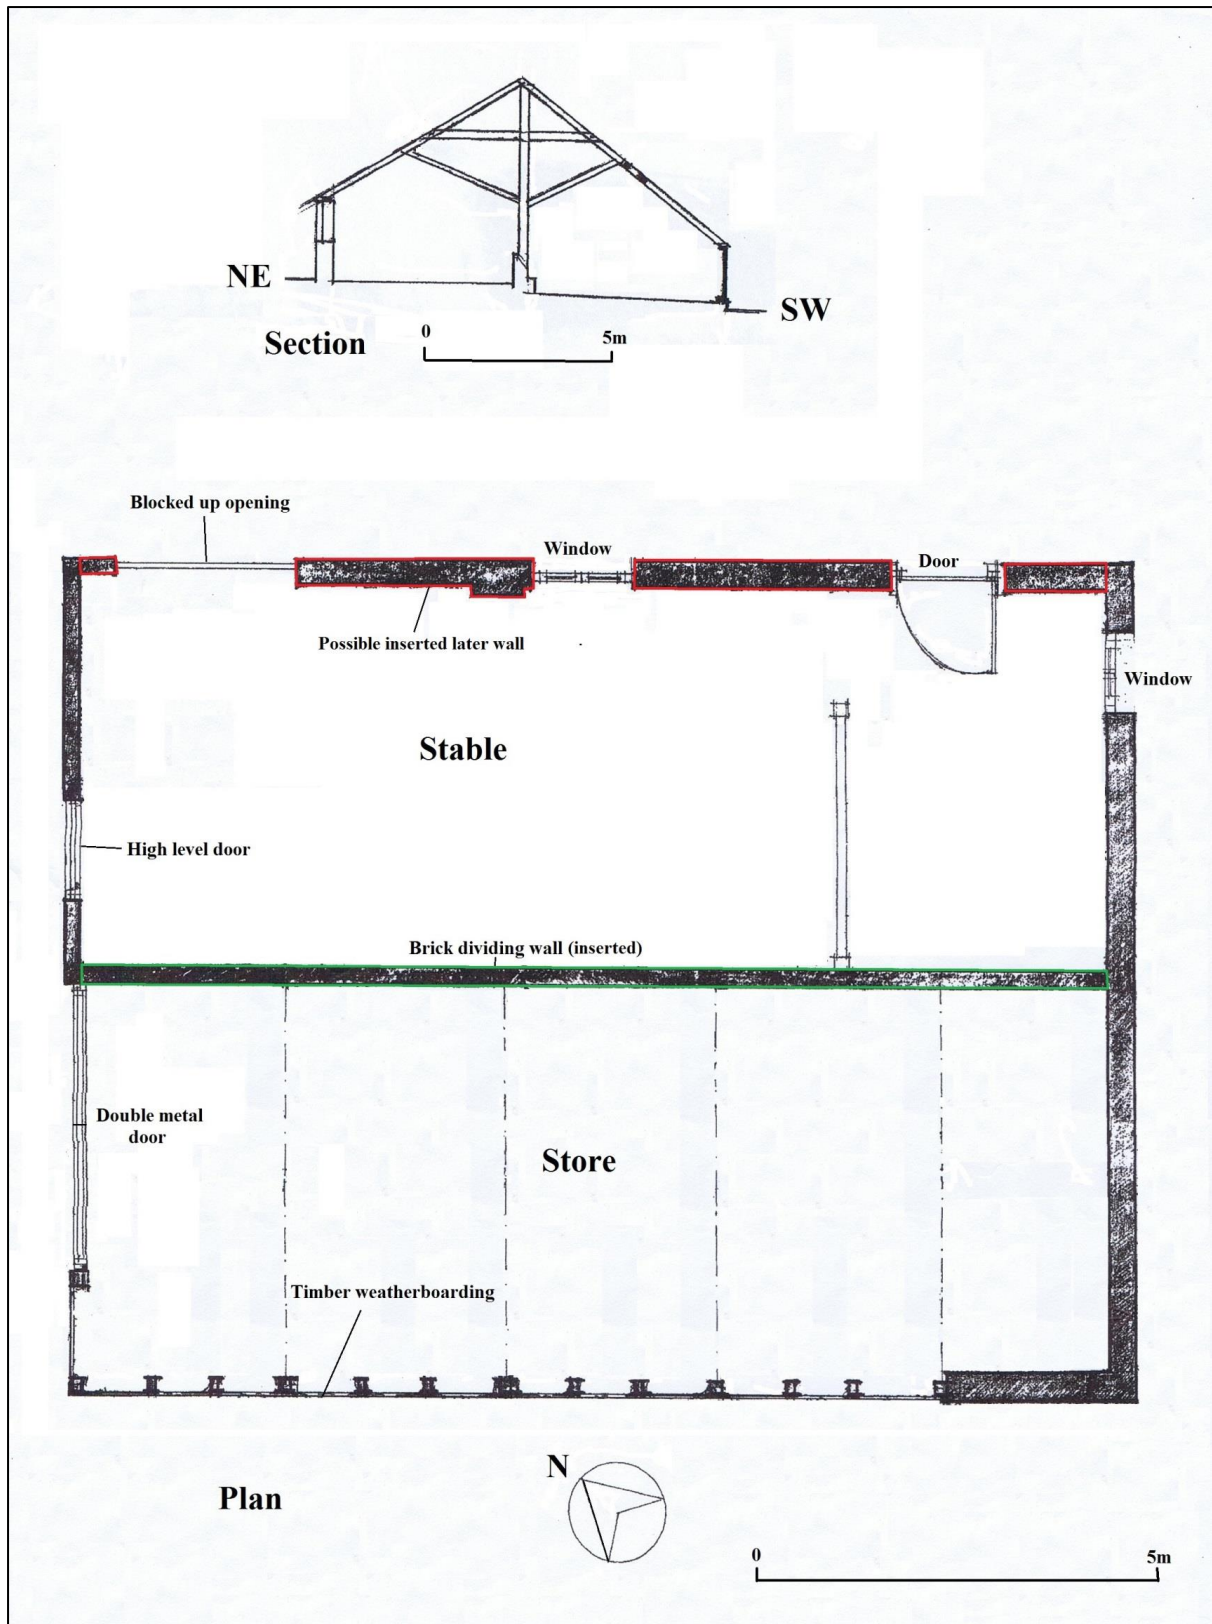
Fishponds Barn, Hastings: Plan and section of Building
